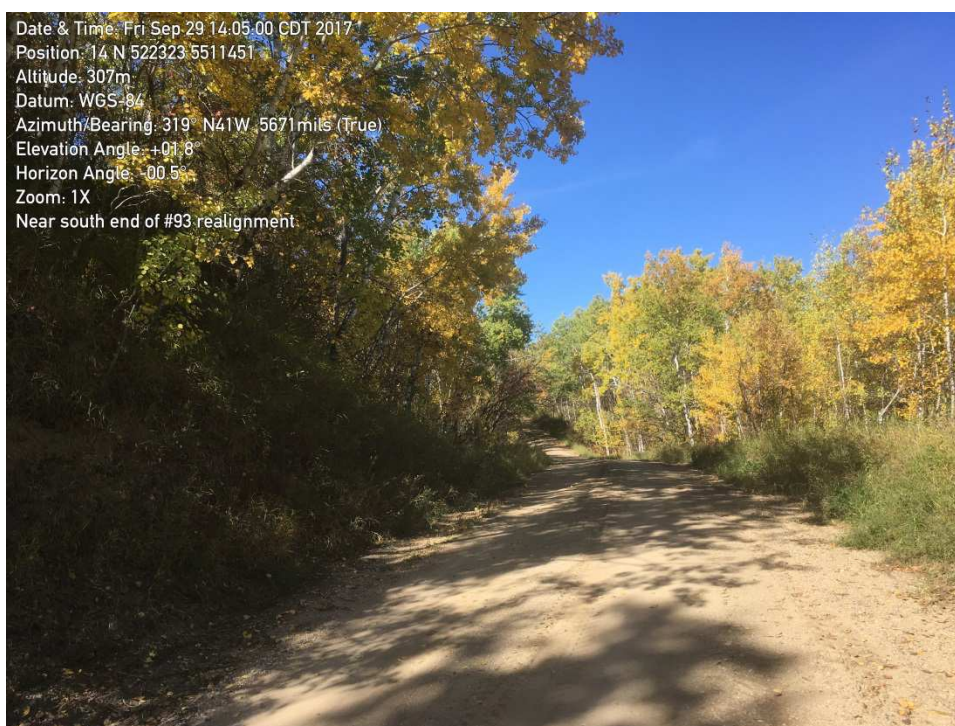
South side of proposed realignment at Site #93 (looking north).
